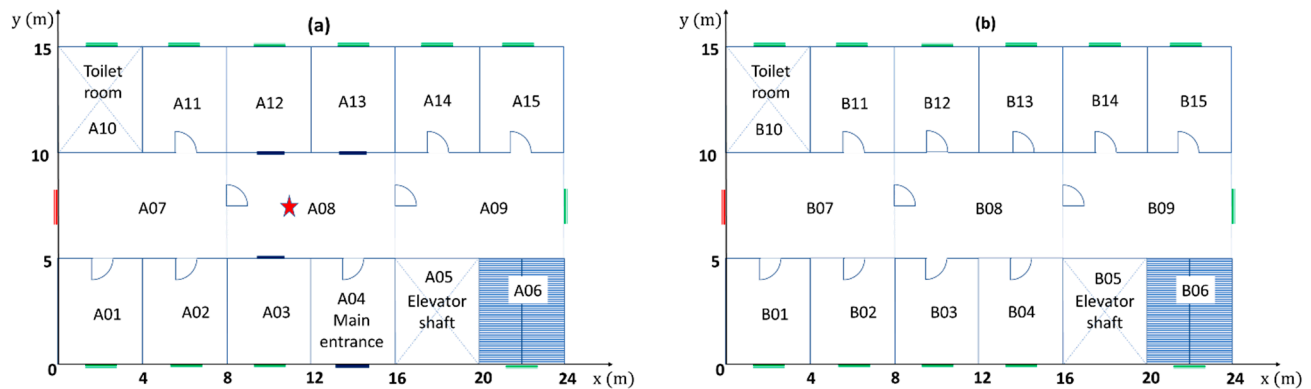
Plans of (a) the first floor ($z = 0$) and (b) the second floor ($z = 3$ m) of the four-story building. The layouts of the compartments on the third and fourth floors (not shown) are identical to that of the second floor. The fire starts in compartment A08 (red star).
